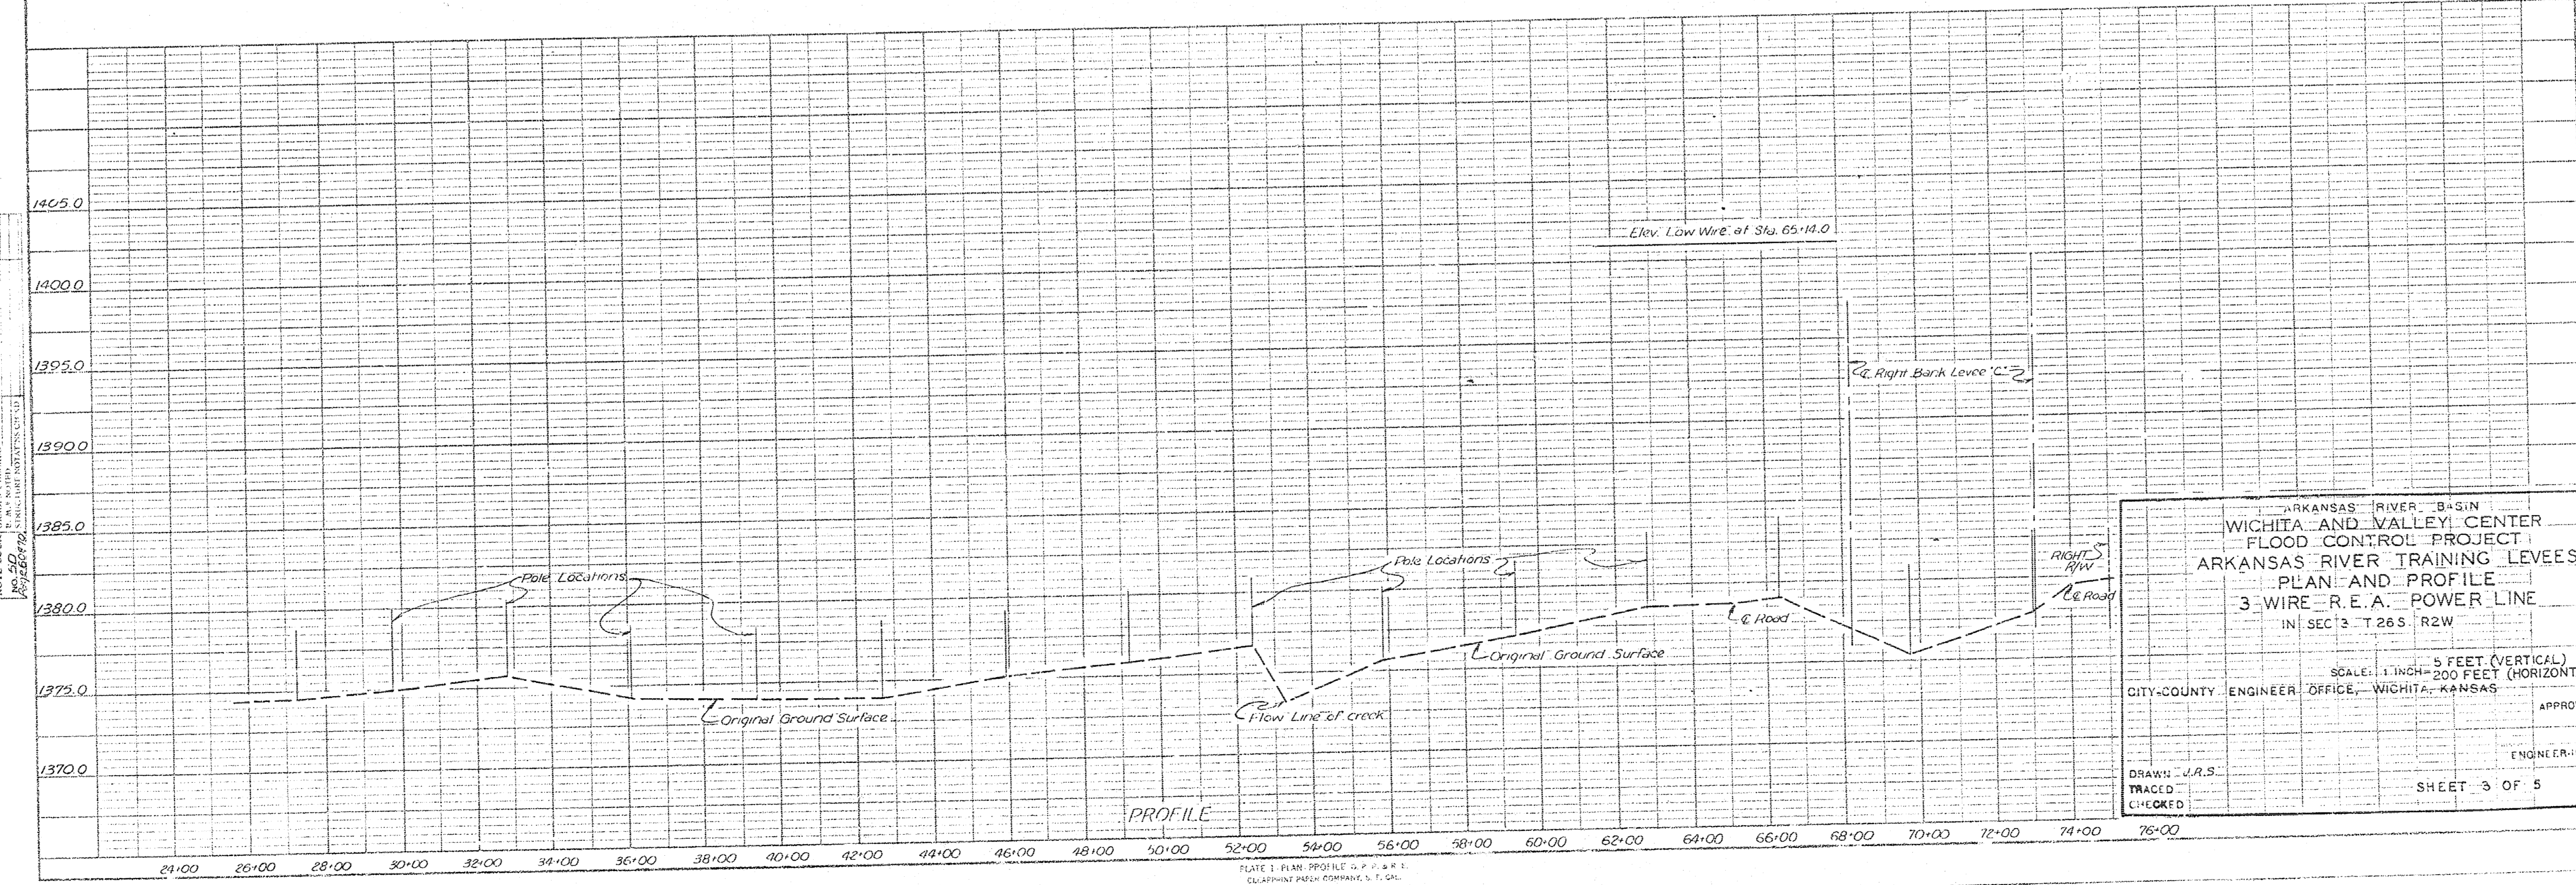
PLAN PROFILE 0. P. R. S. P. L.
